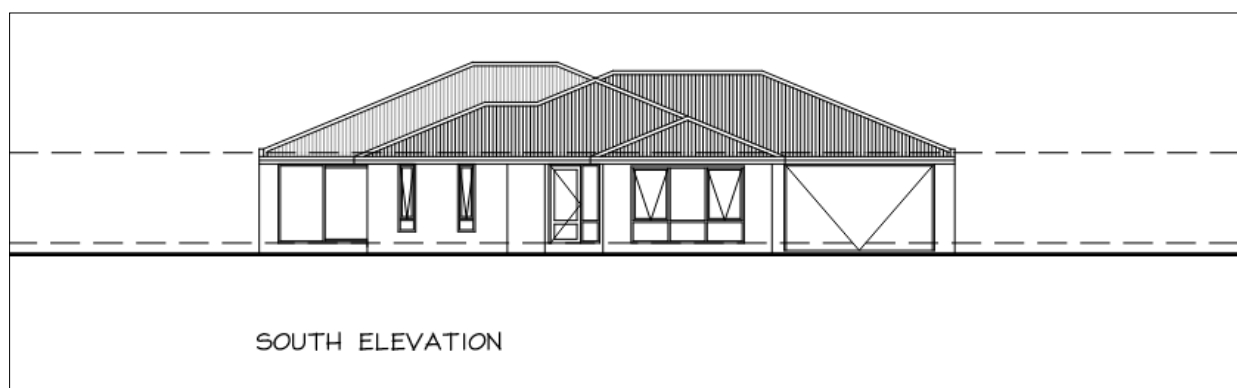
South elevation (Steven Penton Building Design, 2022)
